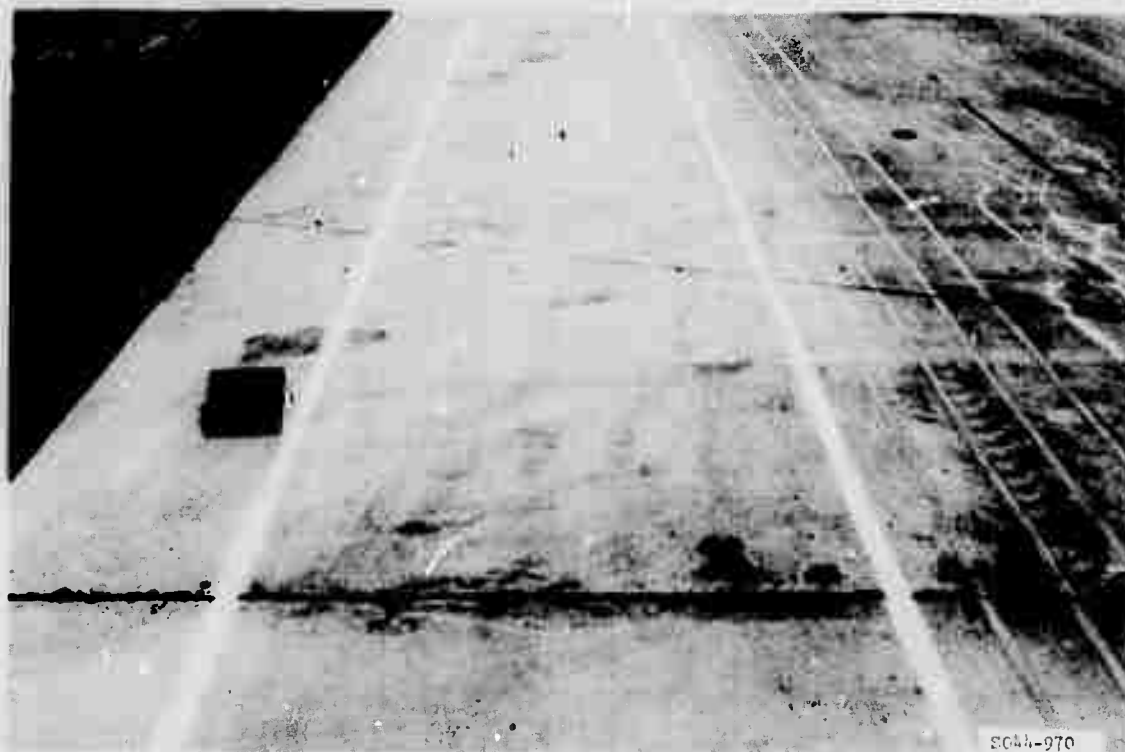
Item 2, lane 2, rigid pavement test section, prior to traffic
